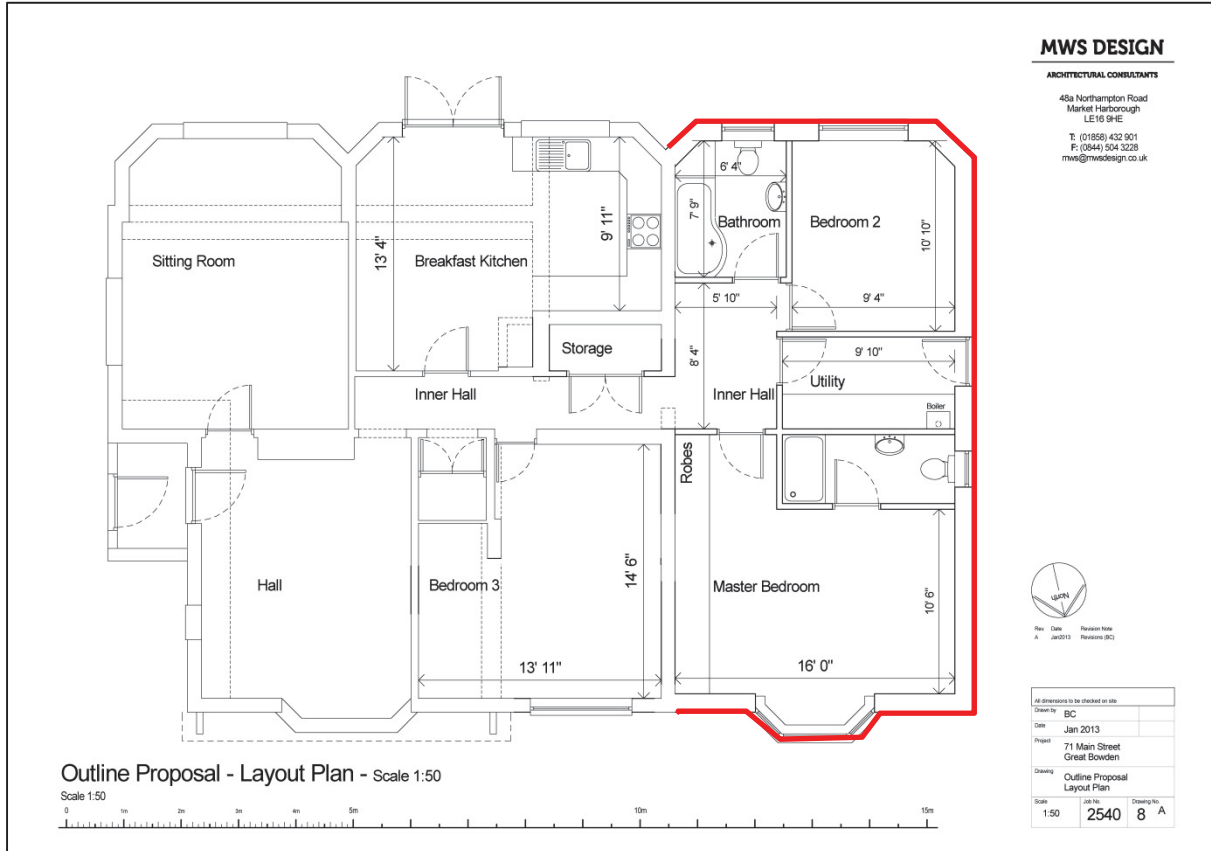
Proposed site plan, supplied by MWS Design, showing new built element highlighted in red.
